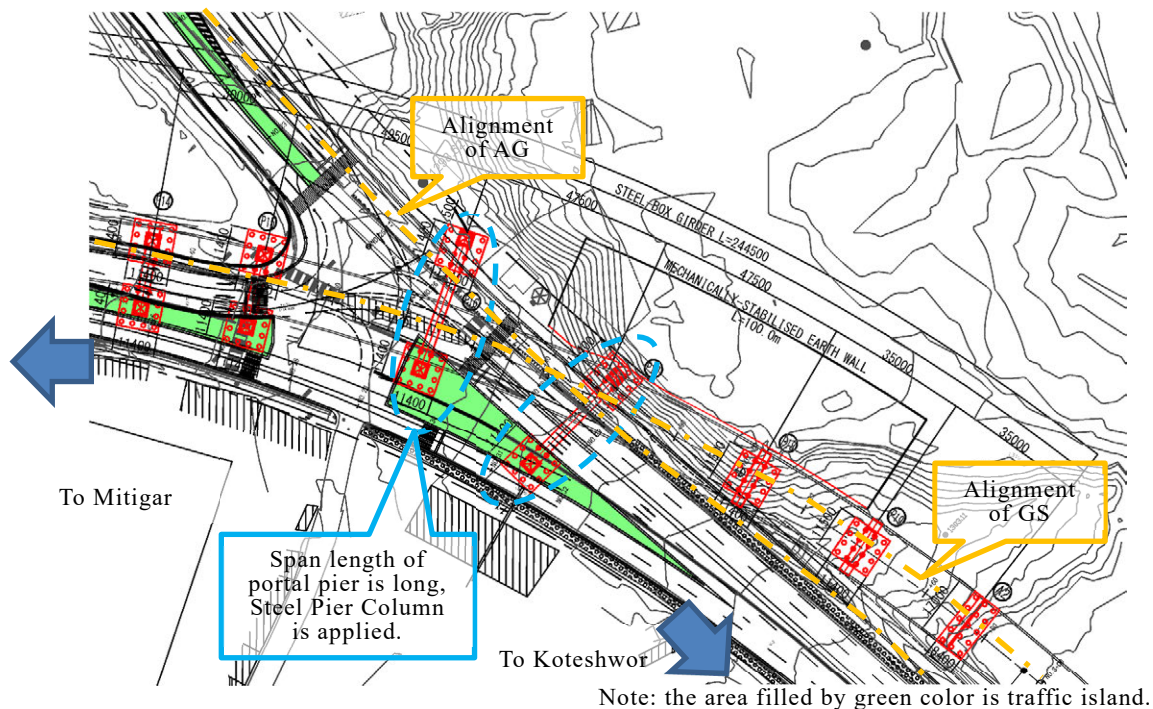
Span Arrangement West of the Tinkune Intersection
